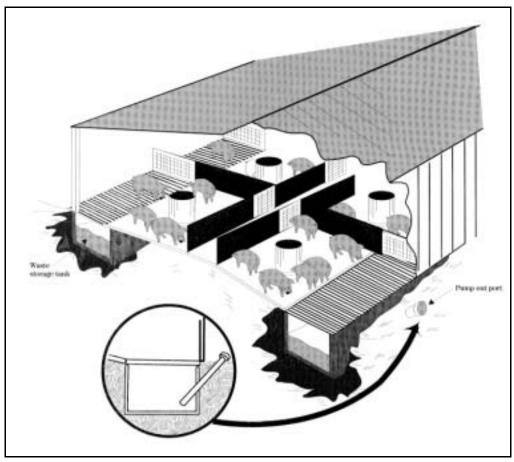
Fed hogs in confined area with concrete floor and tank storage liquid manure handling (USDA NRCS, 1996).
